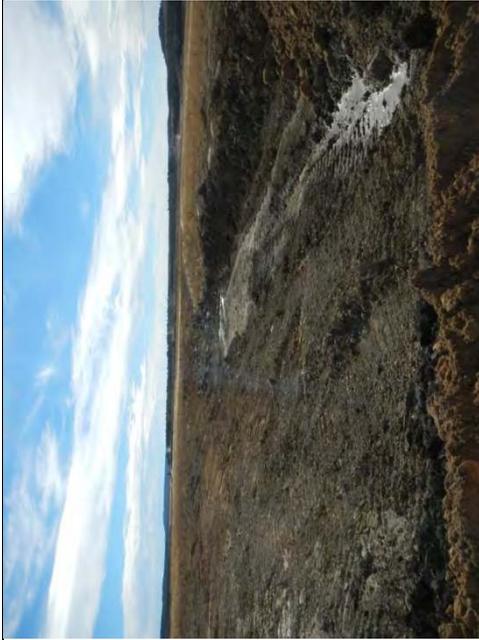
Survey flags locate D-B-1T-U location. Remaining excess spoil topsoil pile in distance.
